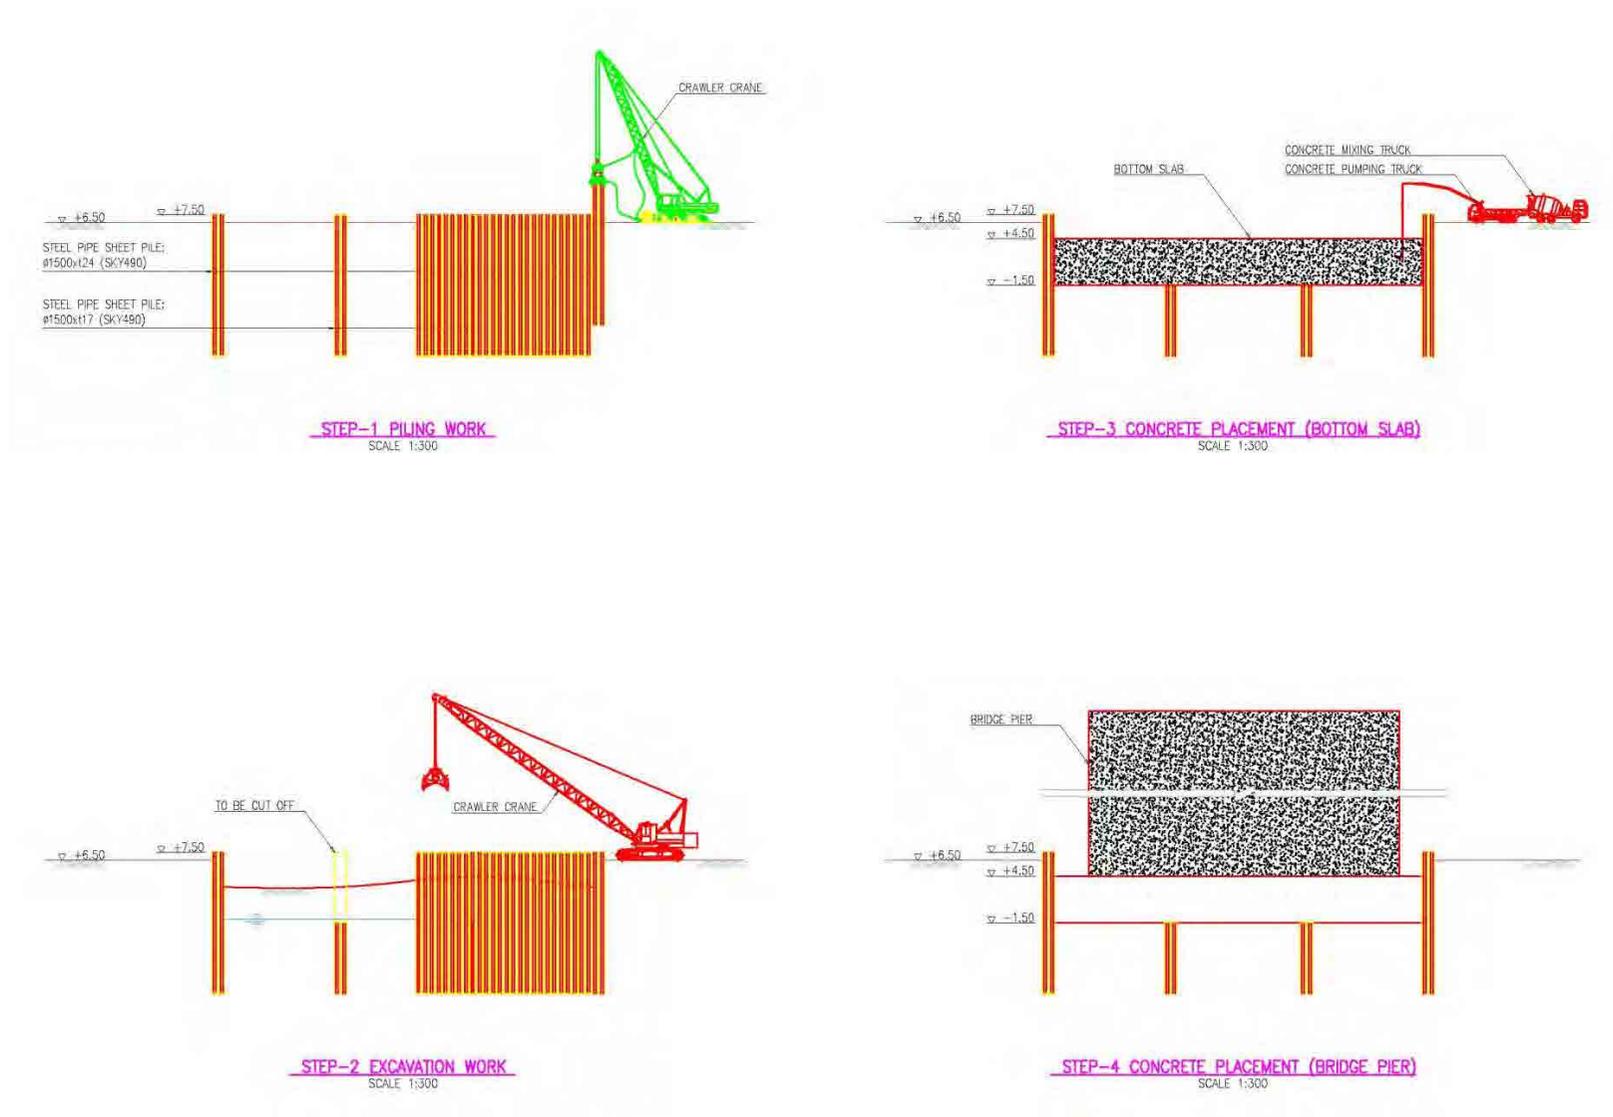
Construction Plan of Substructure and Foundation (West Side: in the Canal) 1/2
